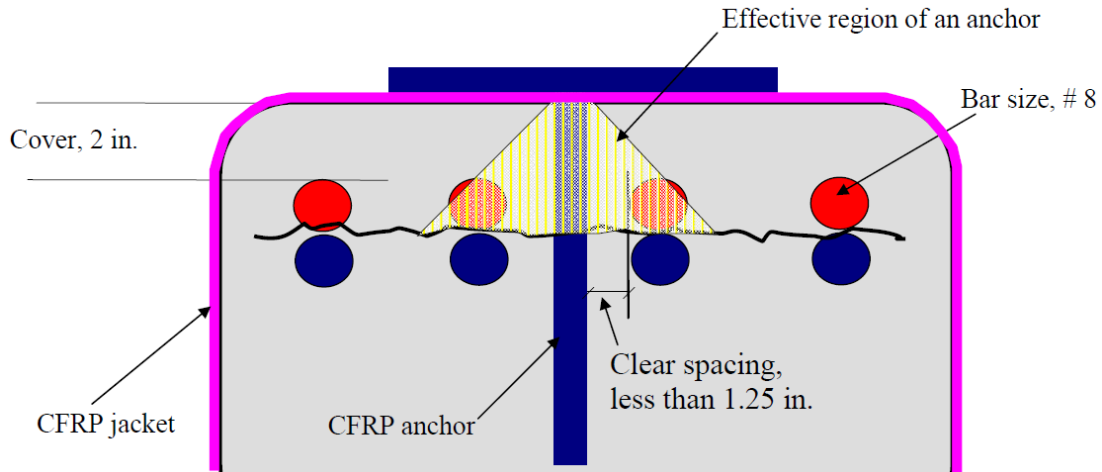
Suggested spacing between CFRP anchor and lap spliced bars (Kim 2008)
